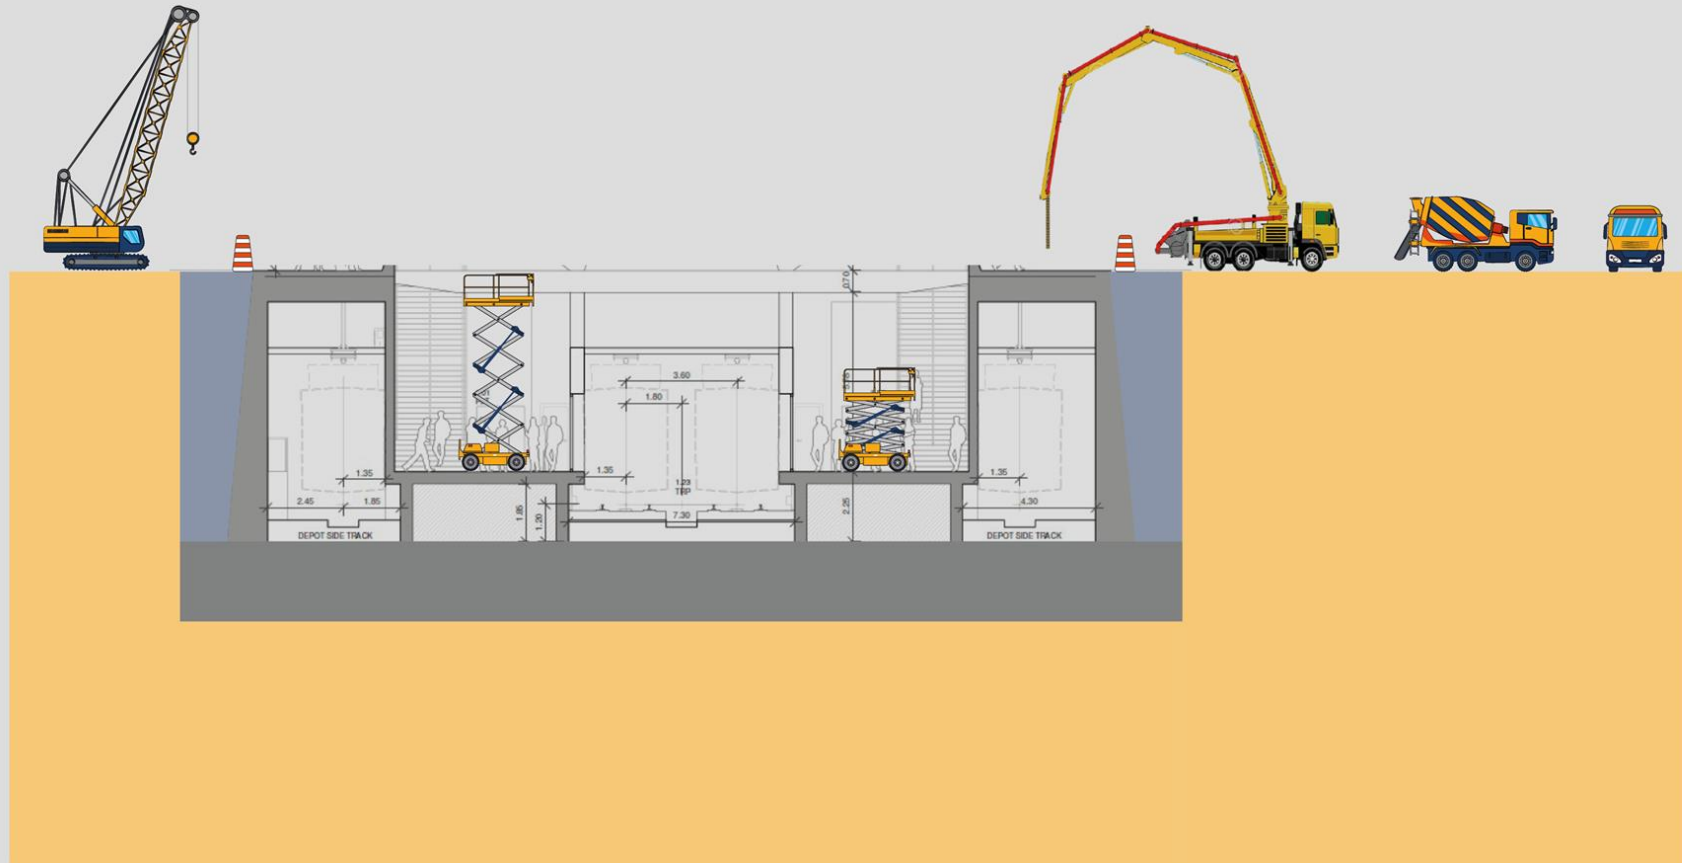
Dardistown Station Construction Platforms, Lift Shafts and Stairs
